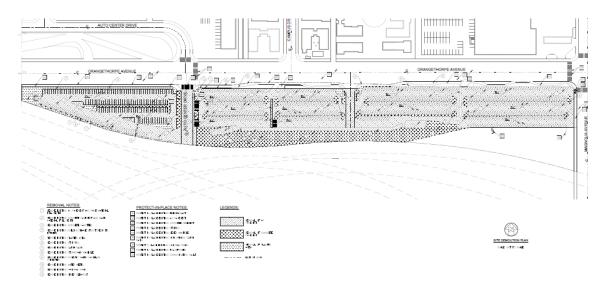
PROPOSED SITE DEMOLITION PLAN
